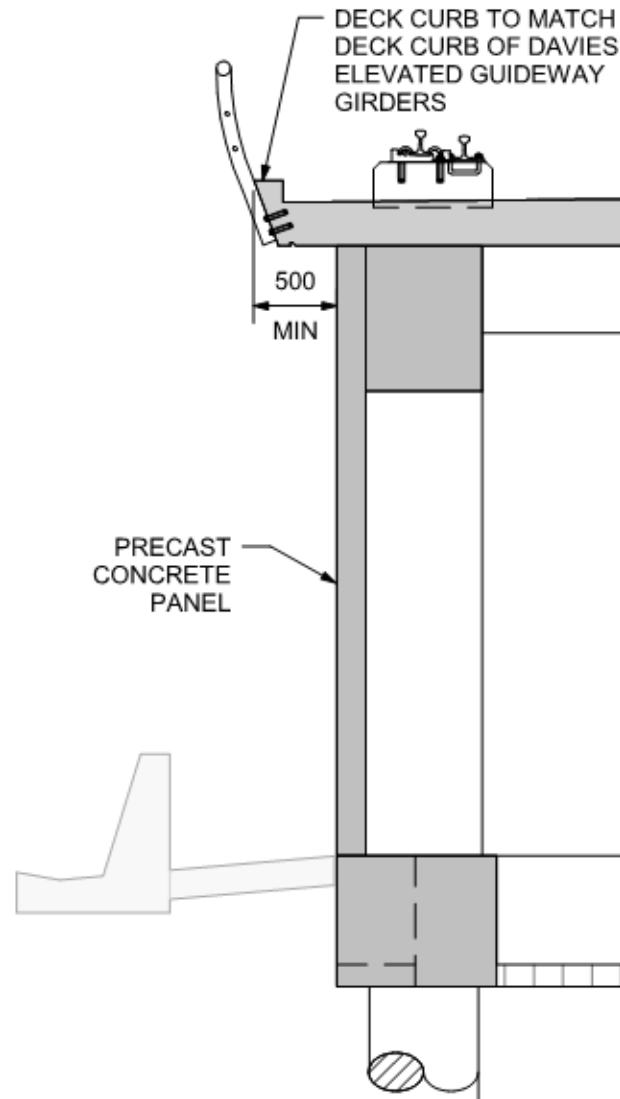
C: Davies Elevated Guideway Partial Ramp Section
